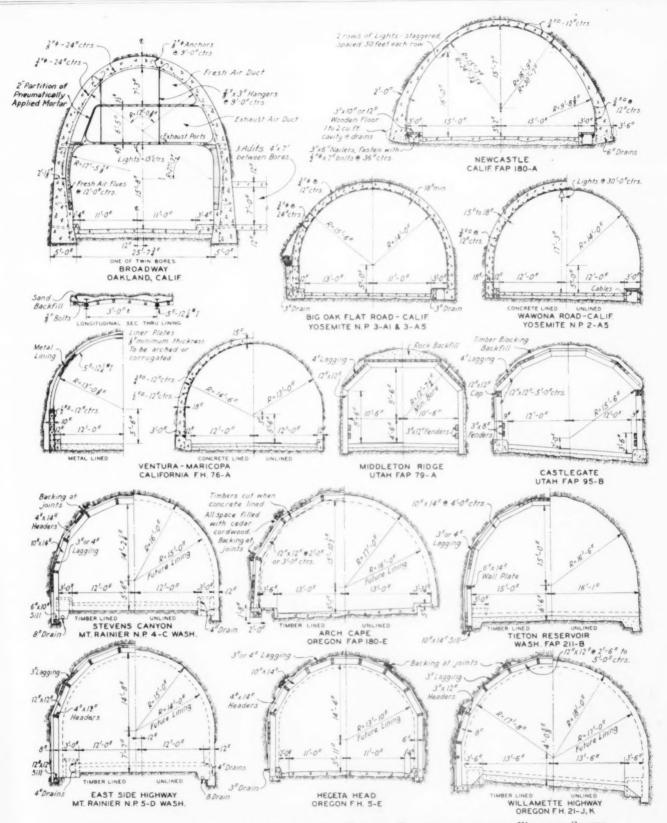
CROSS SECTIONS OF SEVERAL HIGHWAY TUNNELS CONSTRUCTED IN THE WESTERN STATES.
